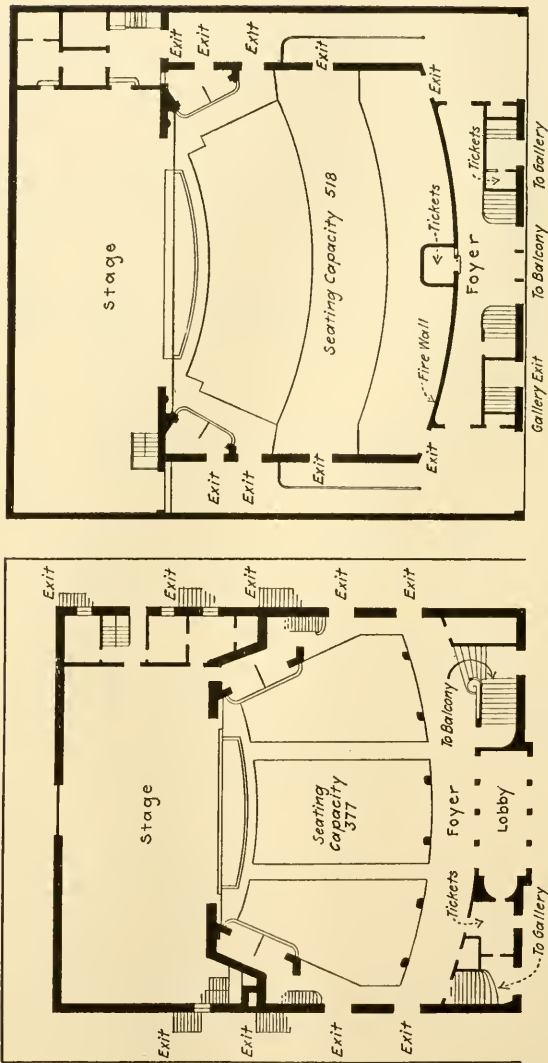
TYPICAL AND PROPOSED THEATER PLAN SHOWING USE OF FIRE WALLS, SIDE ENTRANCES AND EXITS
